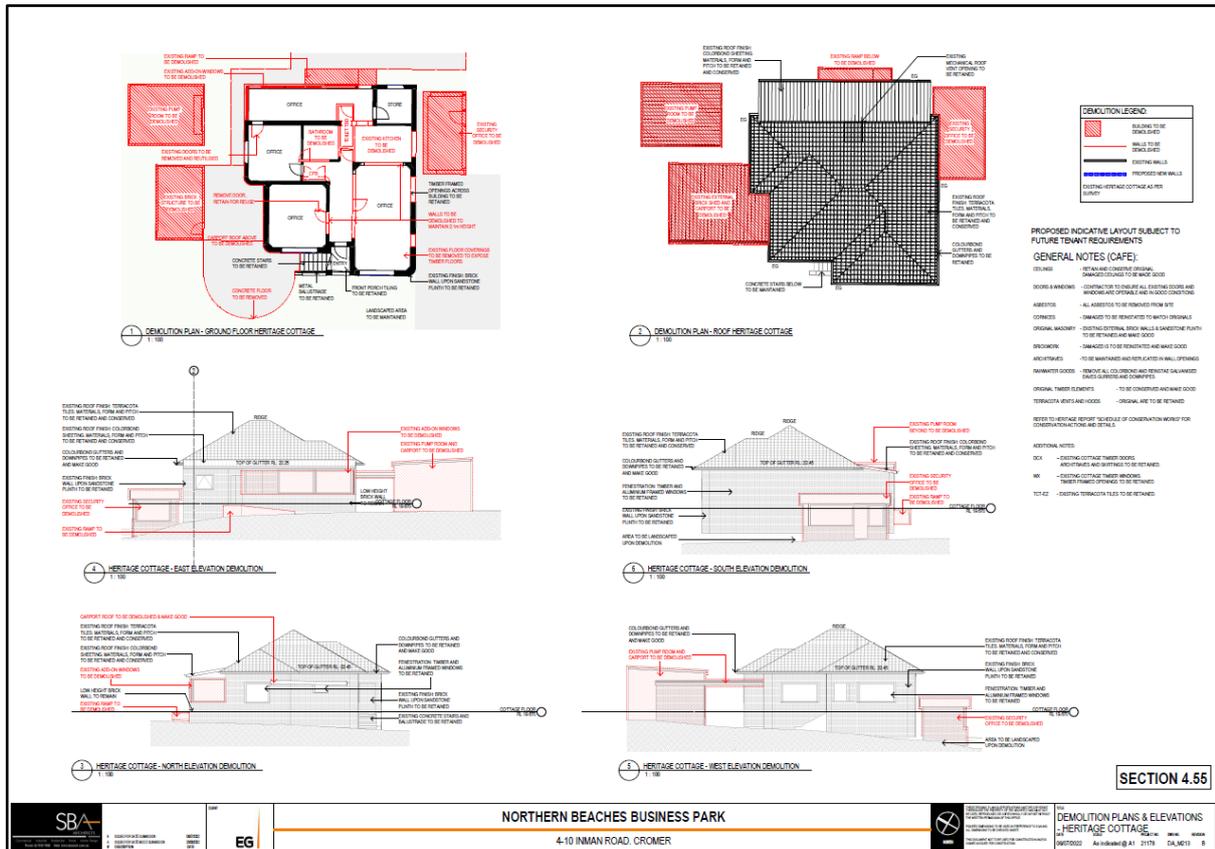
Demolition Plans & Elevations – Heritage Cottage
